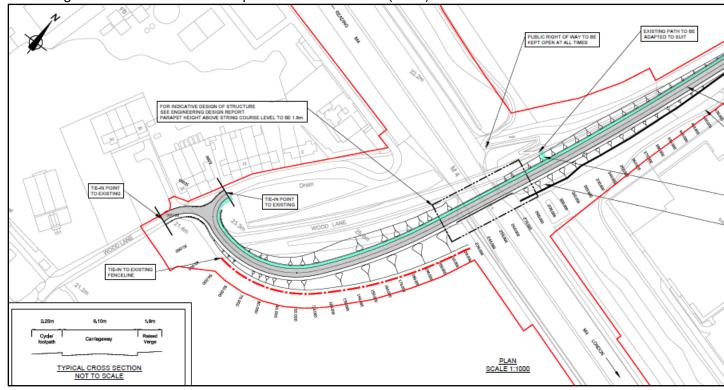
The new bridge is to be built to the east of the existing bridge. Offline construction was chosen for the replacement of Wood Lane overbridge because Wood Lane is the only means of providing vehicular access to the Sewage Treatment Works and residential properties on the south side of the mainline. The revised alignment will move the road away from the residential properties near the southwest corner of the bridge and allows an improvement of the alignment of the tight 180-degree bend to the south of the M4.
